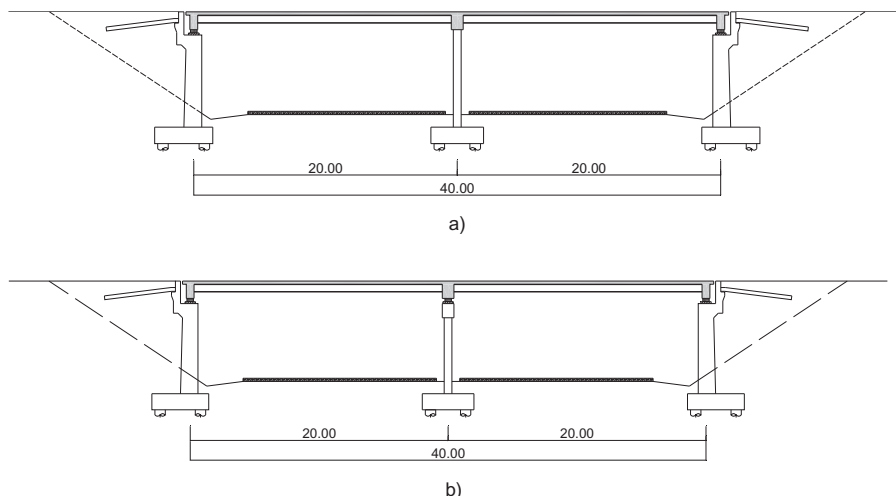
Longitudinal view of the virtual bridge case studies: a) monolithic deck-to-pier connection; b) simply supported deck-to-pier connection.
